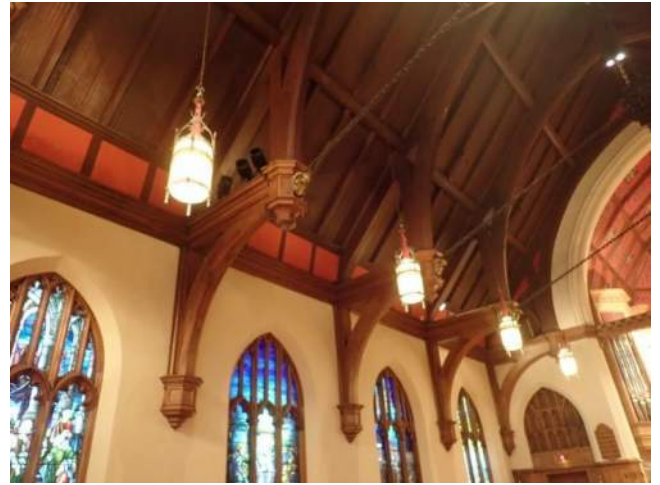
View of the barrel vaulted trusses and exposed wood structure of the nave roof.
